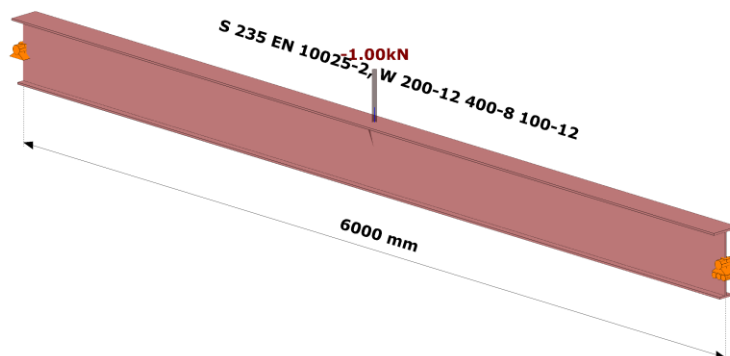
Simple fork supported member with mono-symmetric welded I section subjected to transverse force (LTB)
